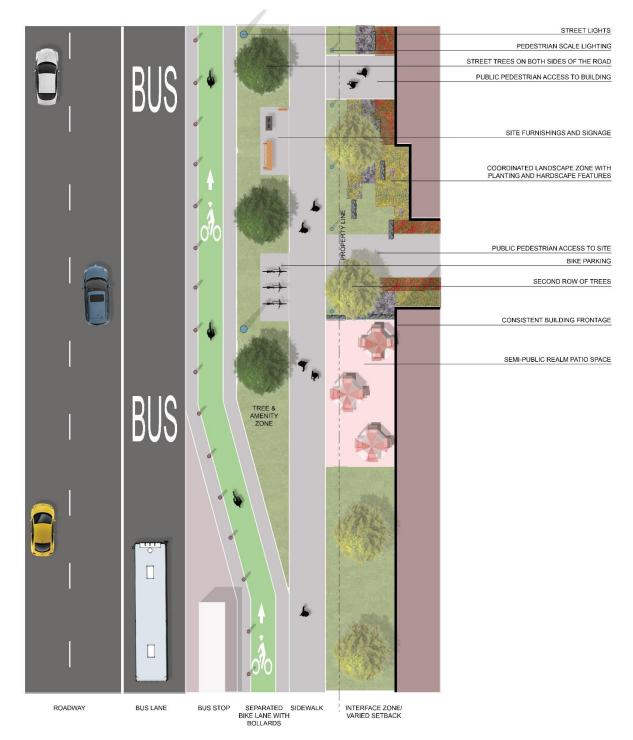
Major Streetscape Improvements, Hespeler Road
